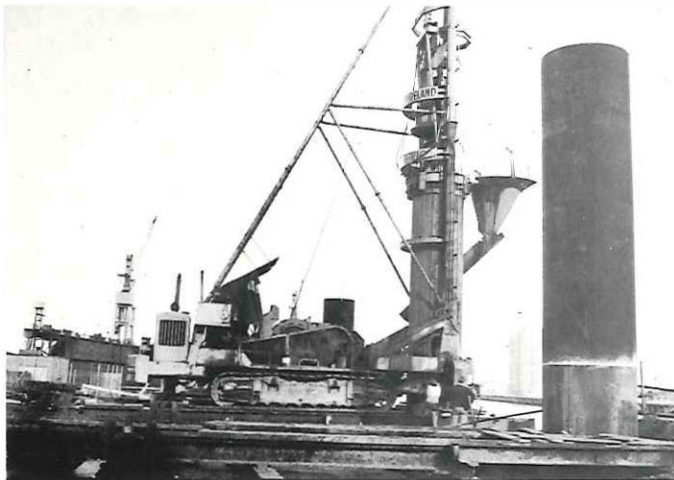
Installation of outer steel casings of piles for the Johnson Street Bridge
